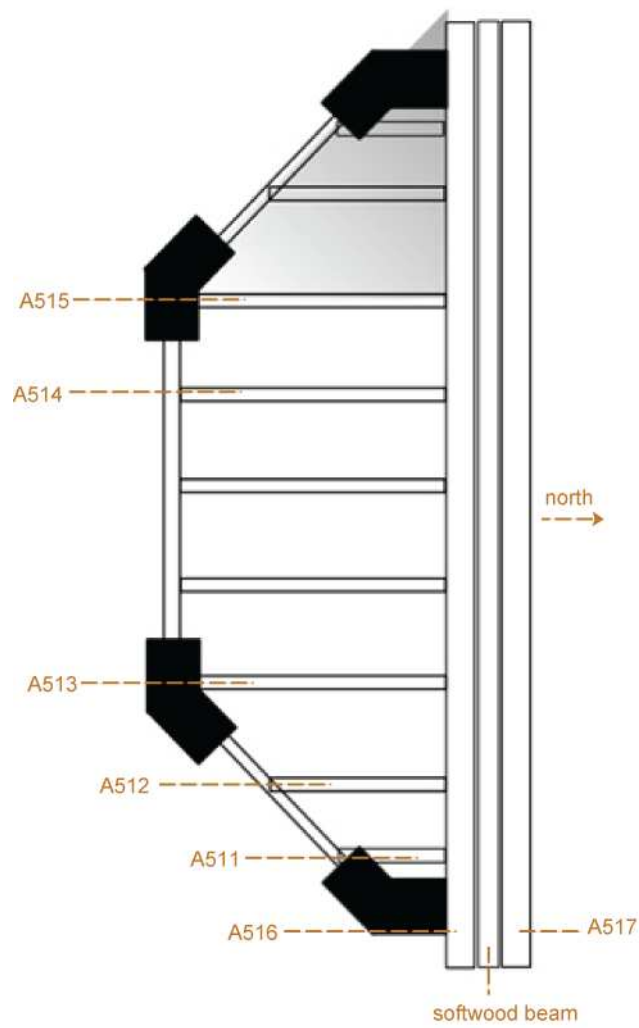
Ceiling joists to bay window of Lady Westmorland's room, showing locations of samples APT-A511–17
